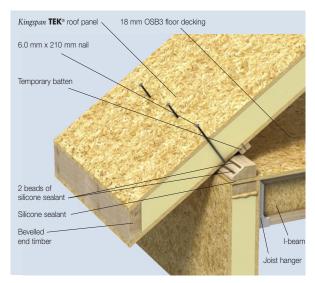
Wall / Roof Intersection Showing Bevelled Wallplate Detail
